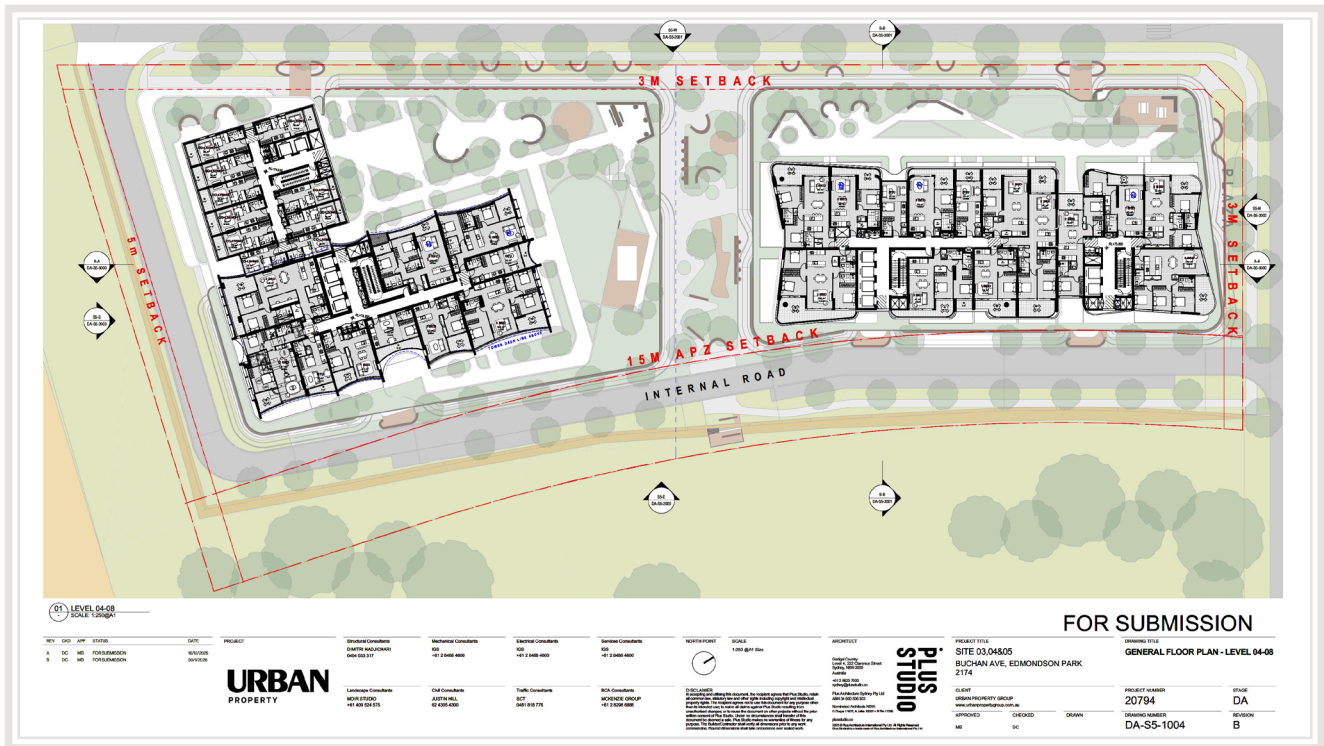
General Floor Plan - lower levels Site 05 - proposed design by Plus Studio.
